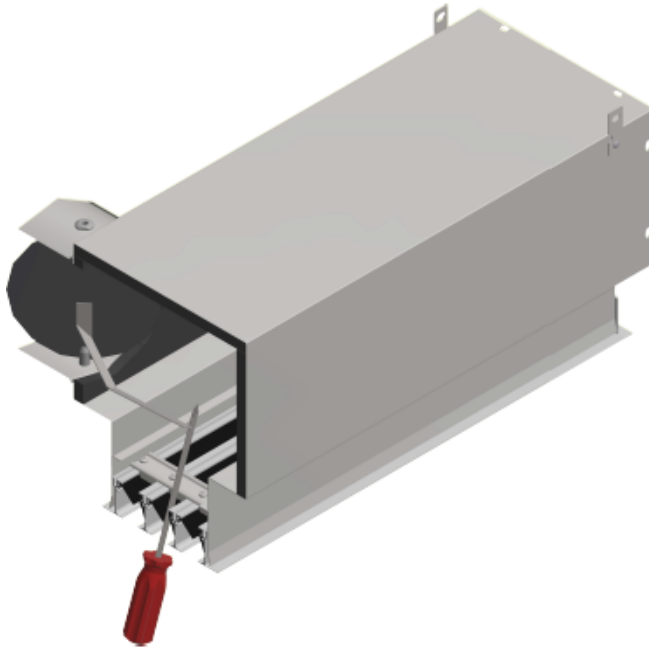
Setting the damper blade, e.g. with a screwdriver
